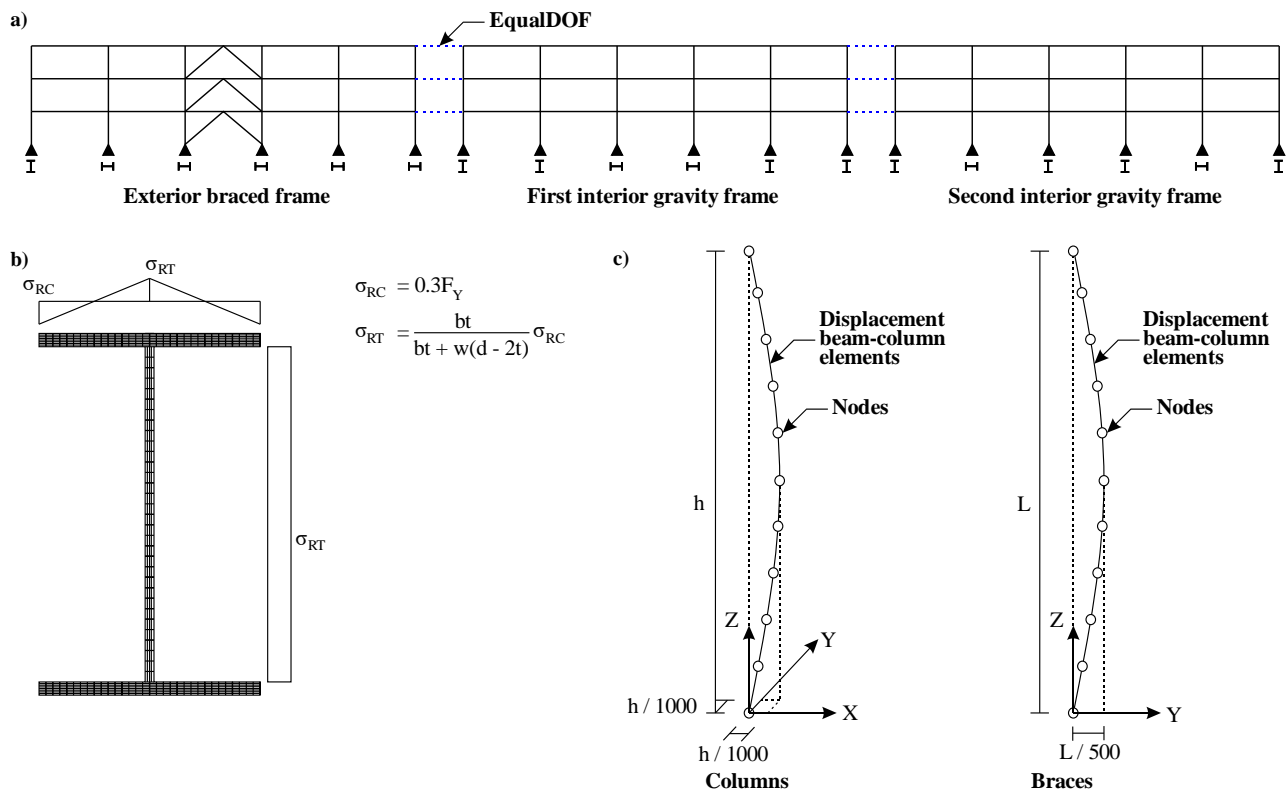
Building detailing: a) Prototype building modeling; b) Residual stress pattern in the columns [15]; c) Out-of-plumbness and element discretization of columns and braces.
